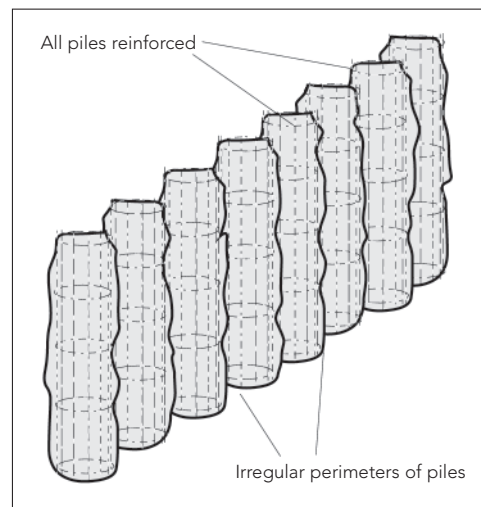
Cast-in-situ piles conform to the final shape of the excavation, leaving a rough surface when exposed.
